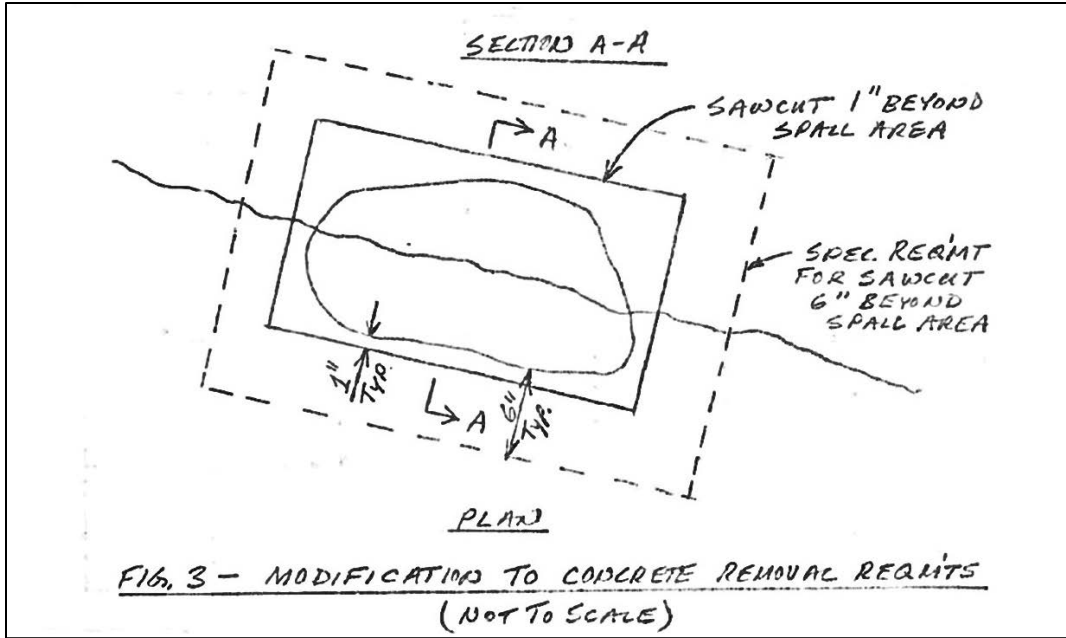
Revision to 2009 Repairs to Reduce the Area of Concrete Removal Around Spalls
